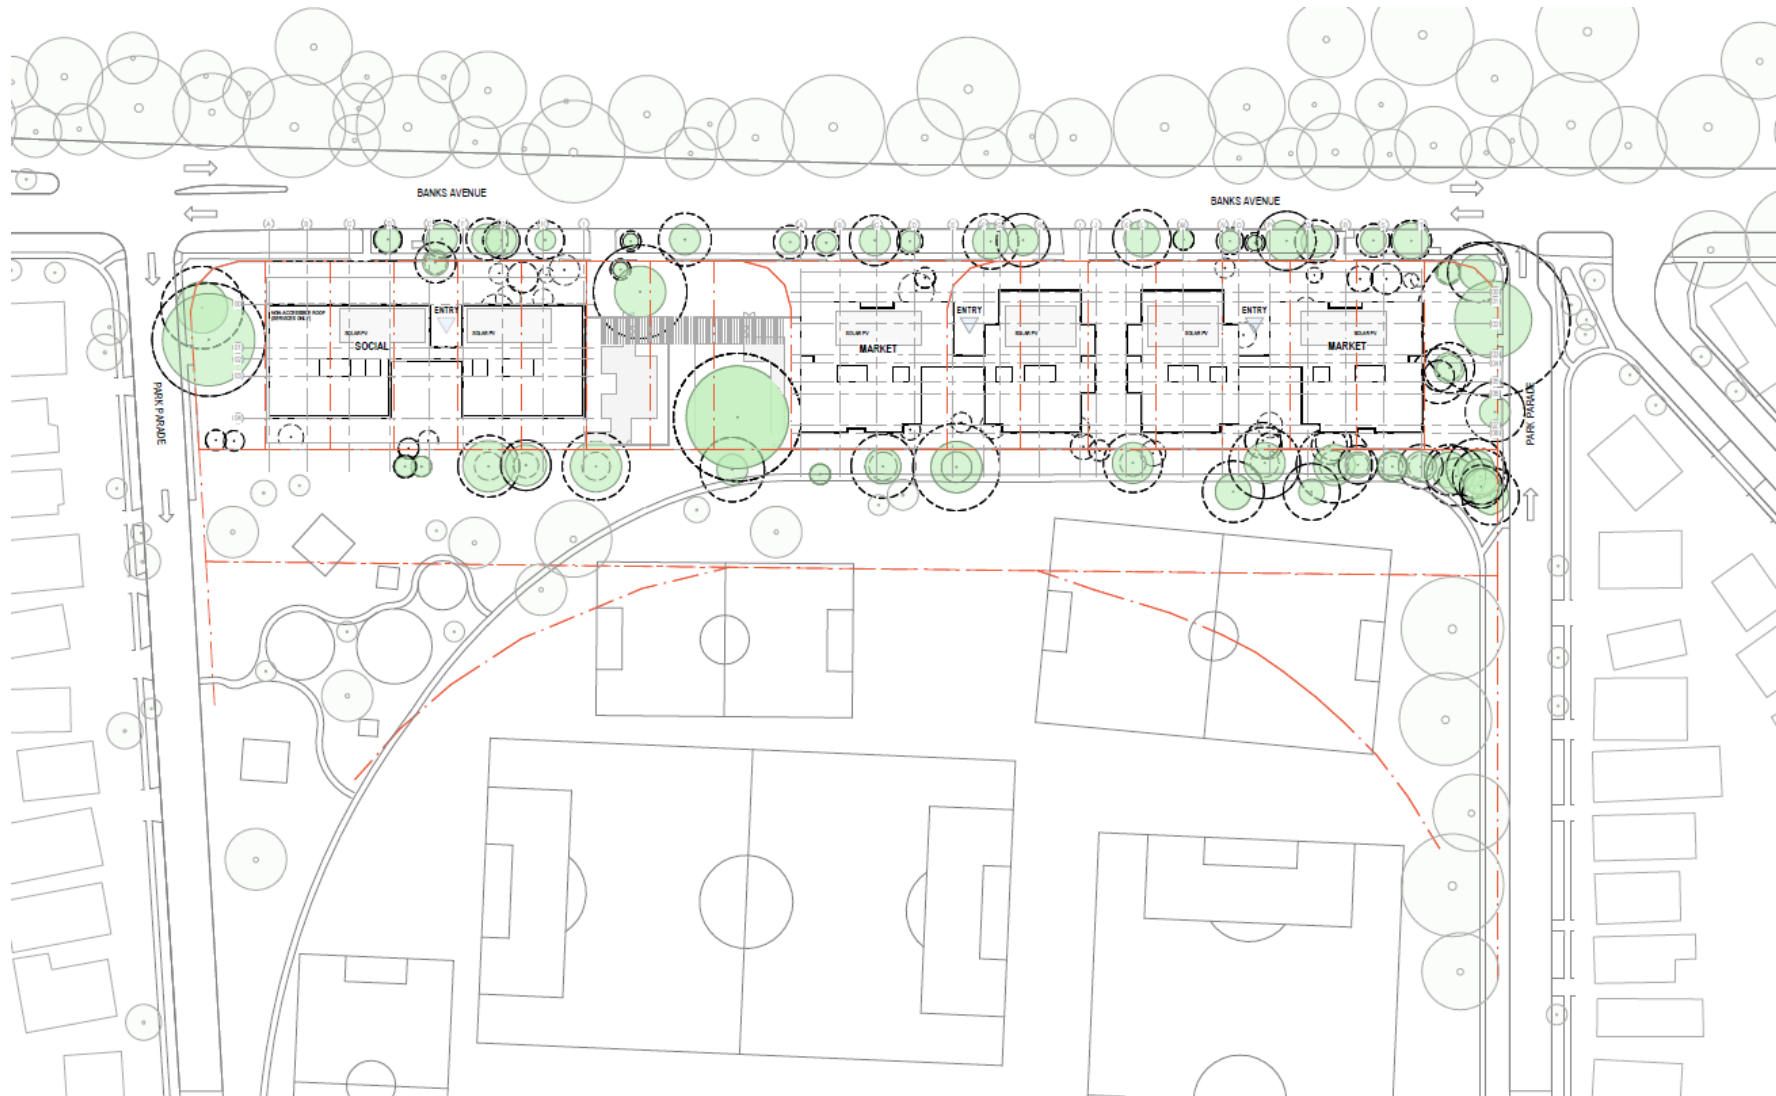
Site Plan. Source: BVN Architects October 2025
